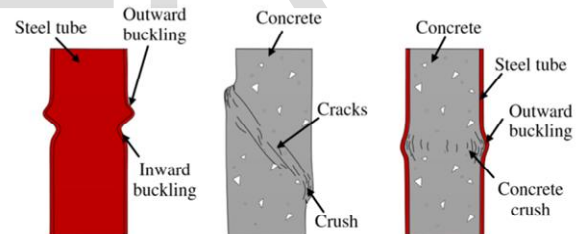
Schematic failure modes of hollow steel tube, concrete and CFST stub columns
